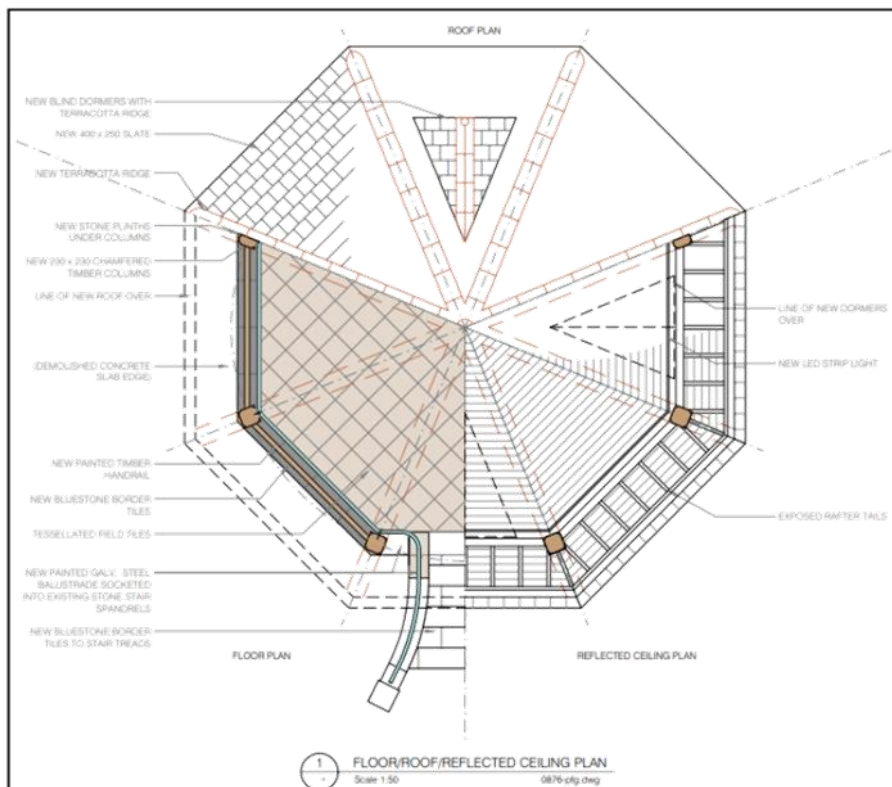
Floor/Roof/Reflected Ceiling Plan. Source: Hector Abrahams Architects
